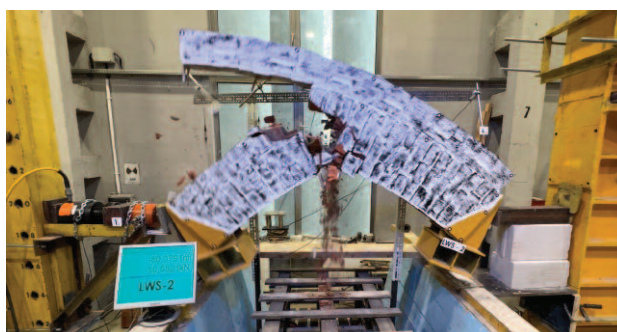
Moment of failure of the arch reinforced with a reinforced concrete rib (LWS)
